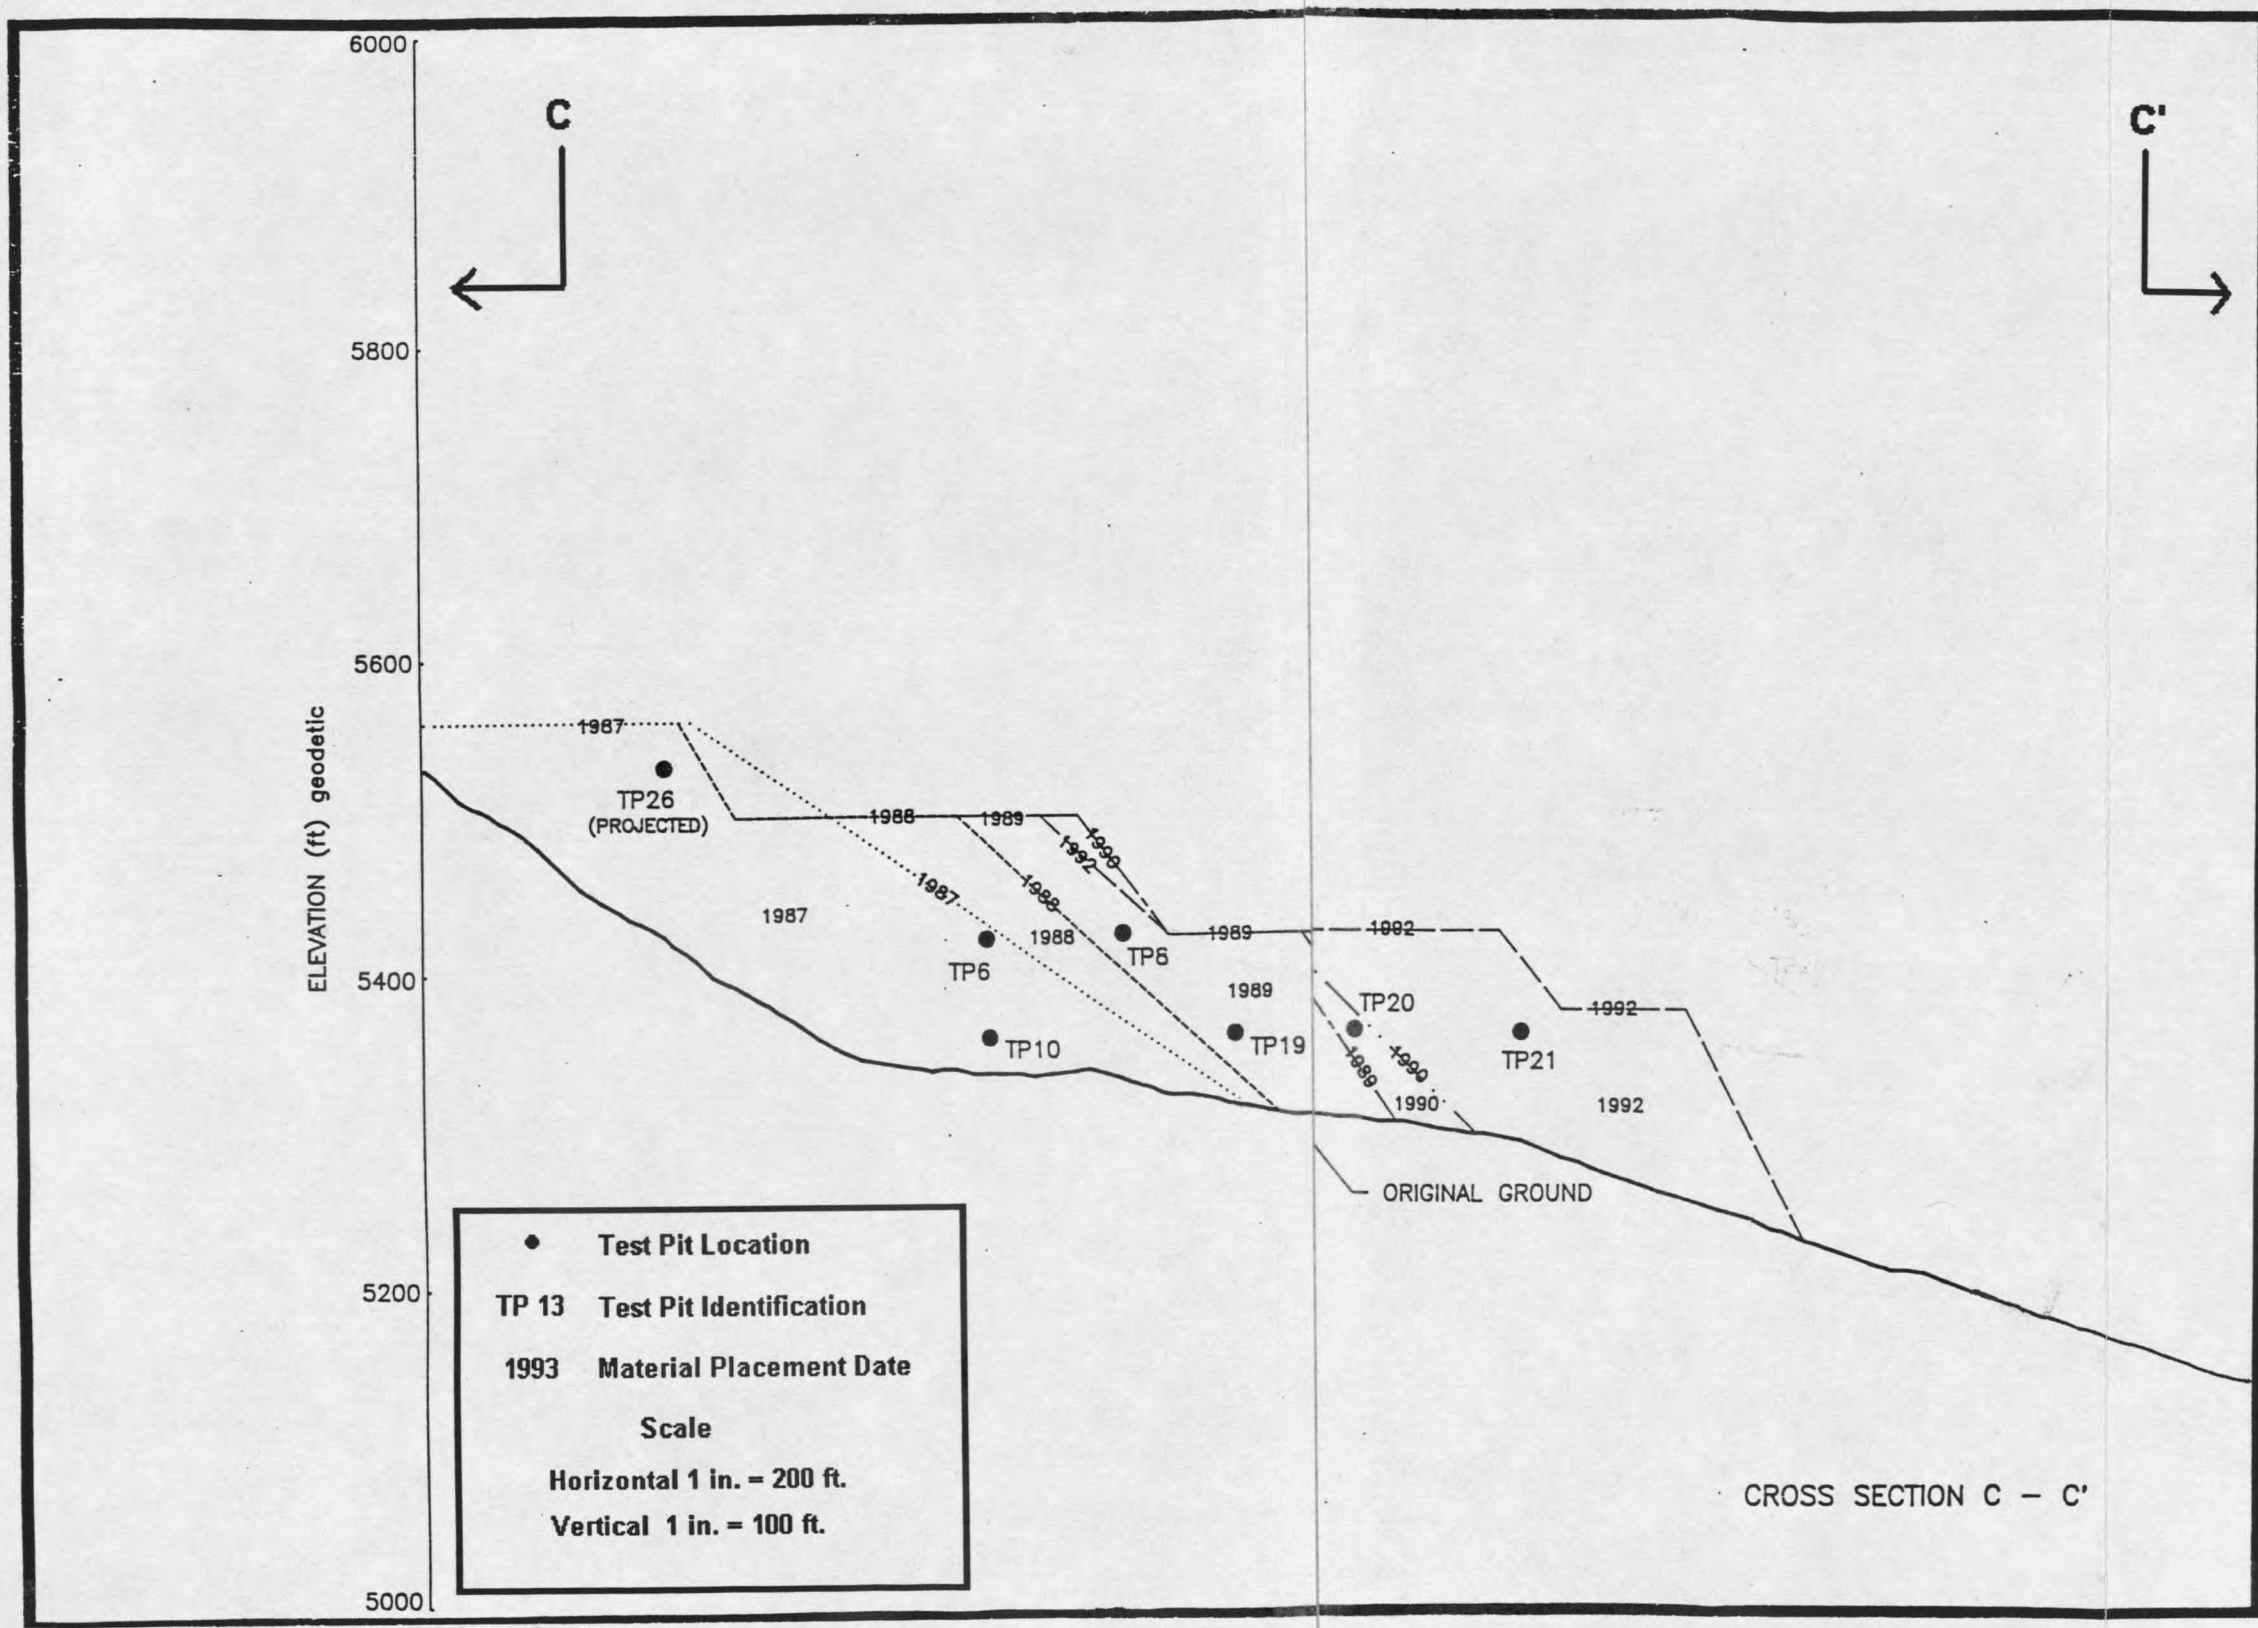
View of waste rock repository vertical plane through cross section C - C'.
